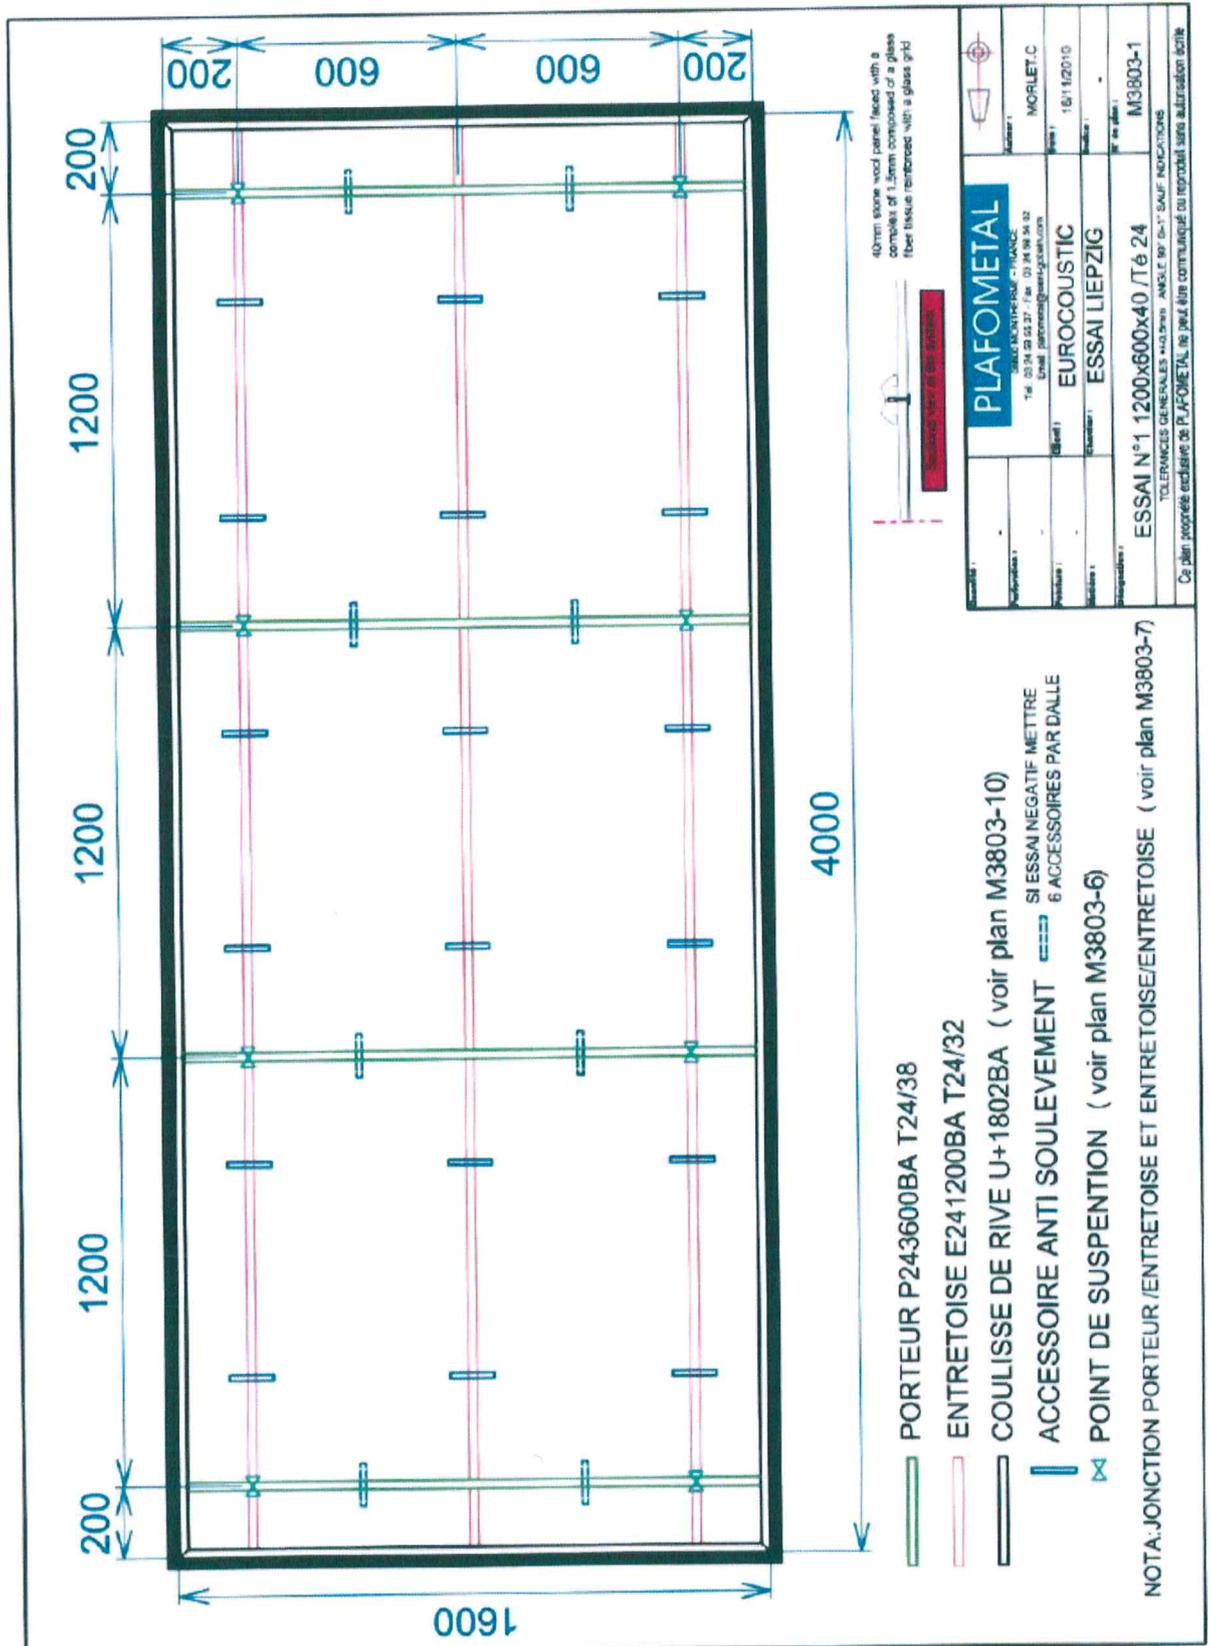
The client's technical drawing of the entire system (grid of 1200 mm x 600 mm)
